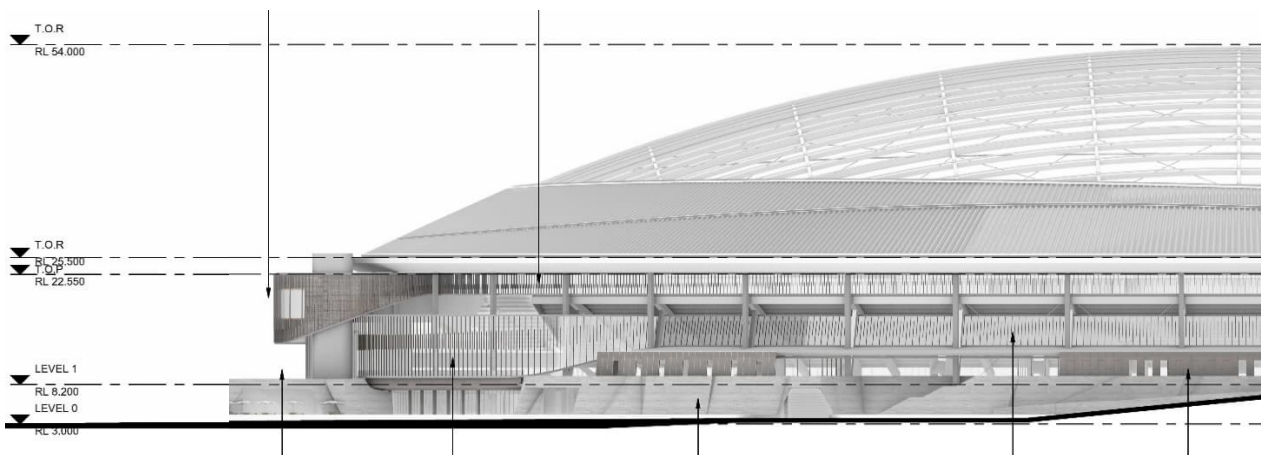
Stadium – Elevations, Maximum Height (COX Architecture)
